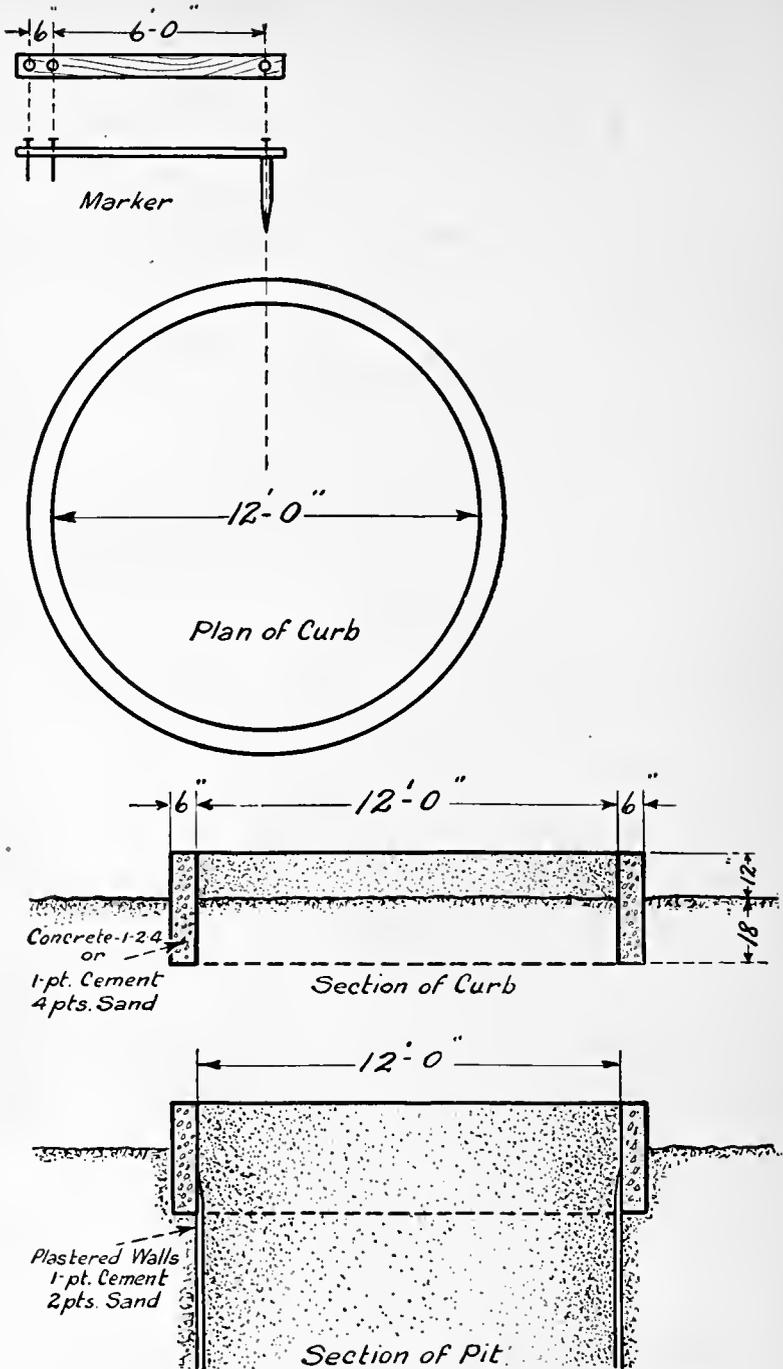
Plans for Constructing a Pit Silo. "Marker," used for laying out surface pattern. "Plan of Curb," showing diameter of silo, thickness of concrete at top and bottom of curb. "Section of Curb," showing dimensions of concrete curb. "Section of Pit," showing silo pit, position of curb, walls of silo, etc.
